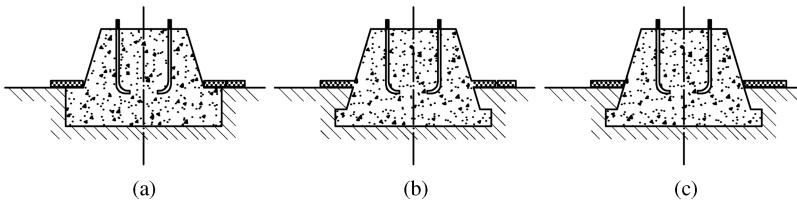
C.9 (a) Connection of machine foundation and floor cover: (b) incorrect; (c) correct.
